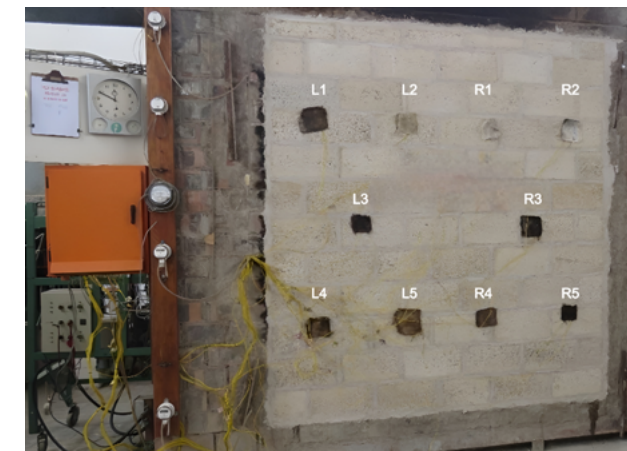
Non-load bearing hemp block wall layout and thermocouple arrangement.
